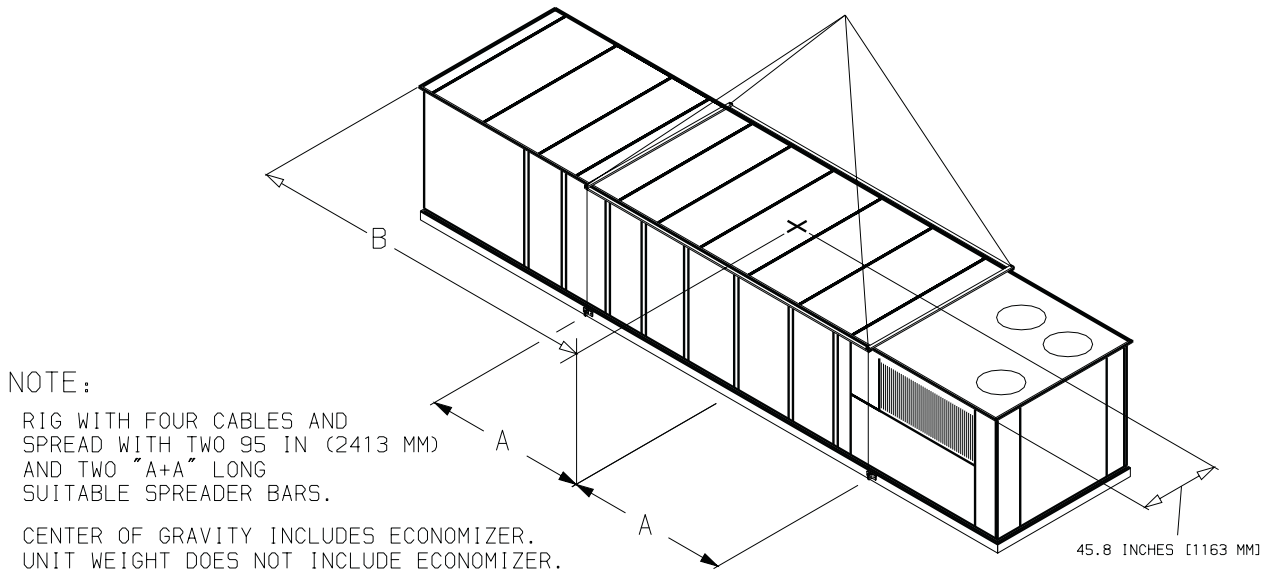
Rigging Label — Size 030-050 Units (Standard Chassis)
